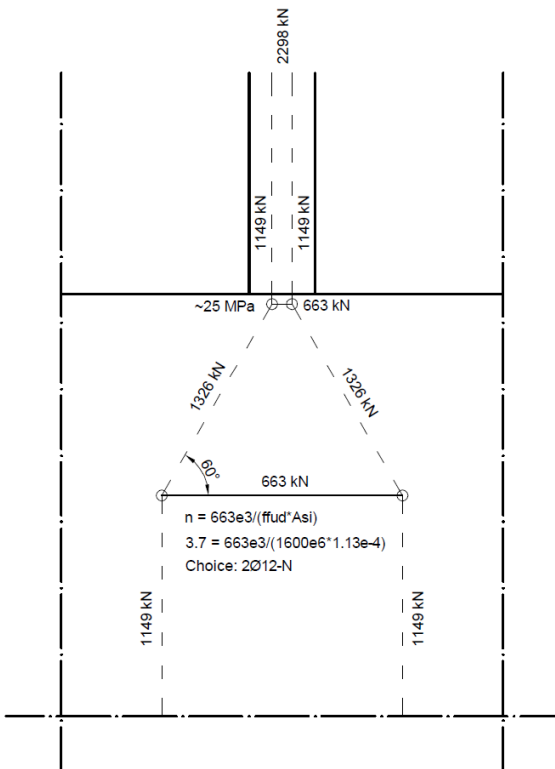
Strut and tie model for design of AFRP splitting reinforcement.
